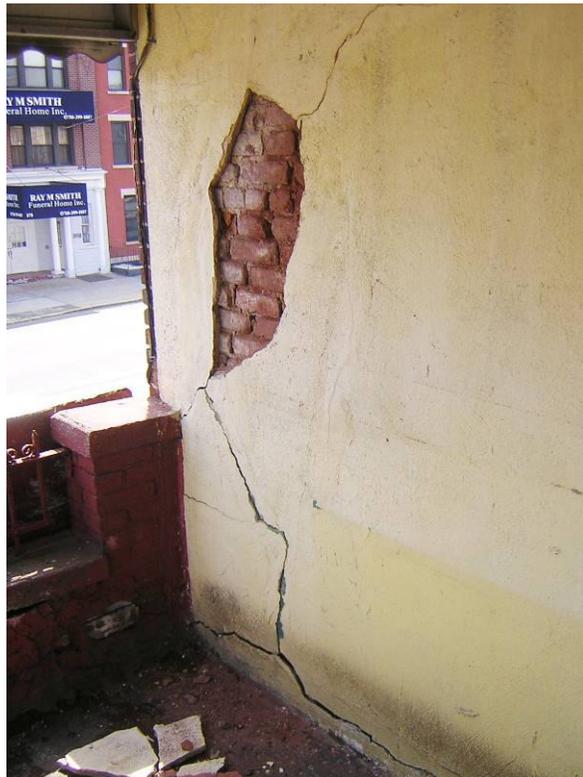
Damaged Masonry Wall At 2nd Floor Terrace of Three-Story Building
